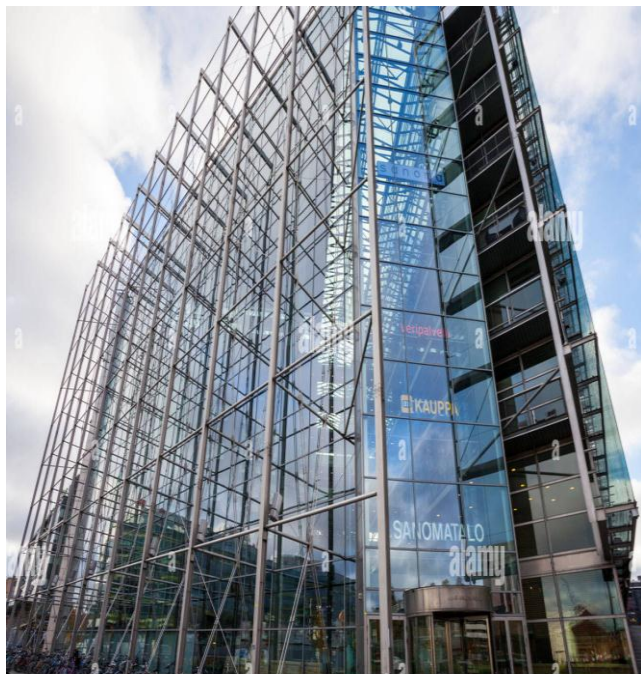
External bracing made of stainless steel, Sanomatalo Structure in Helsinki [5, 9]
